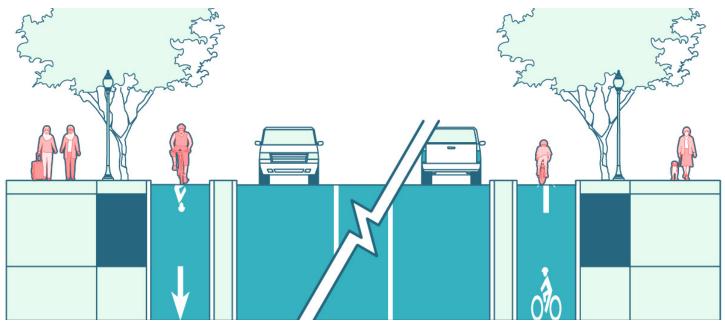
One-way Separated Bike Lane, Curb Separated, Interim Condition: Downtown Street, Town Center Street, Industrial Street
